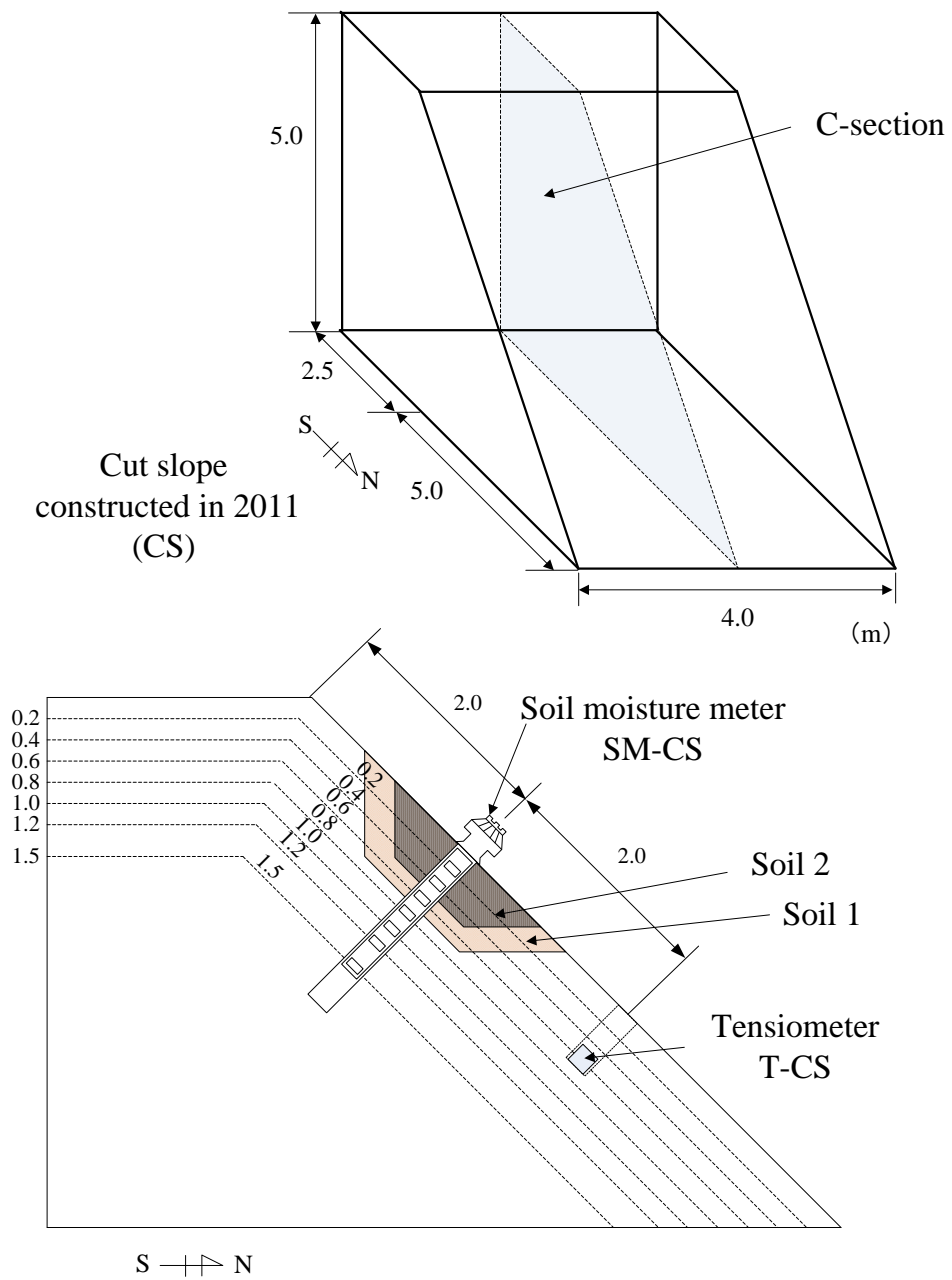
Arrangement of measurement instruments, and Soil 1 and Soil 2 deposited in cut slope
